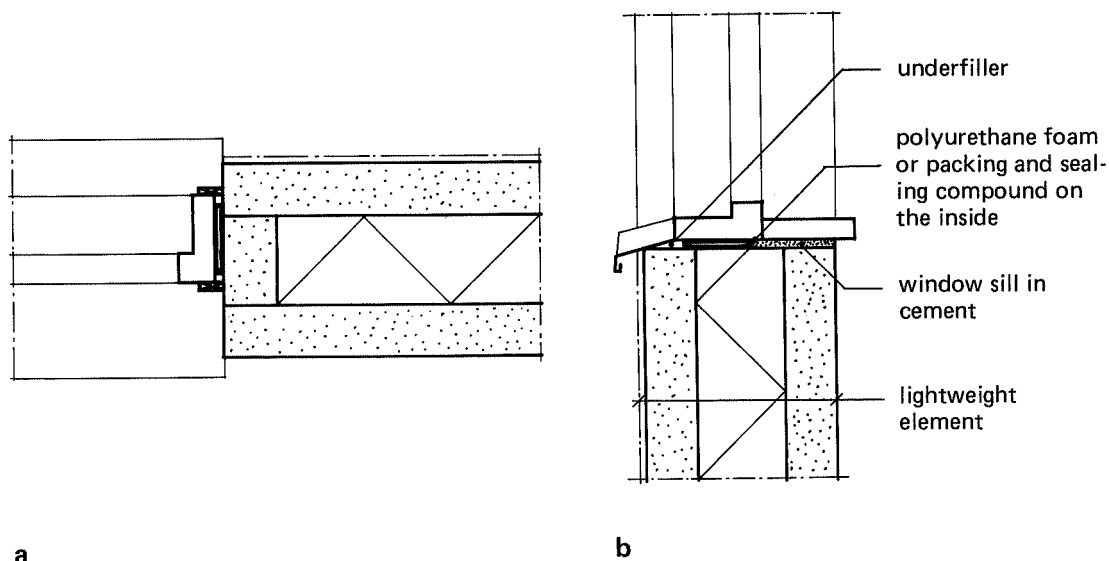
Window attachment in lightweight element. The window frame can be constructed with tucked-in wallpaper and a finishing strip through the actual joint.
